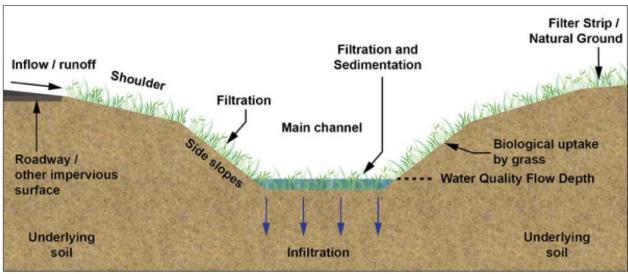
Typical grass swale cross section and stormwater treatment process (Ekka & Hunt, 2020)
